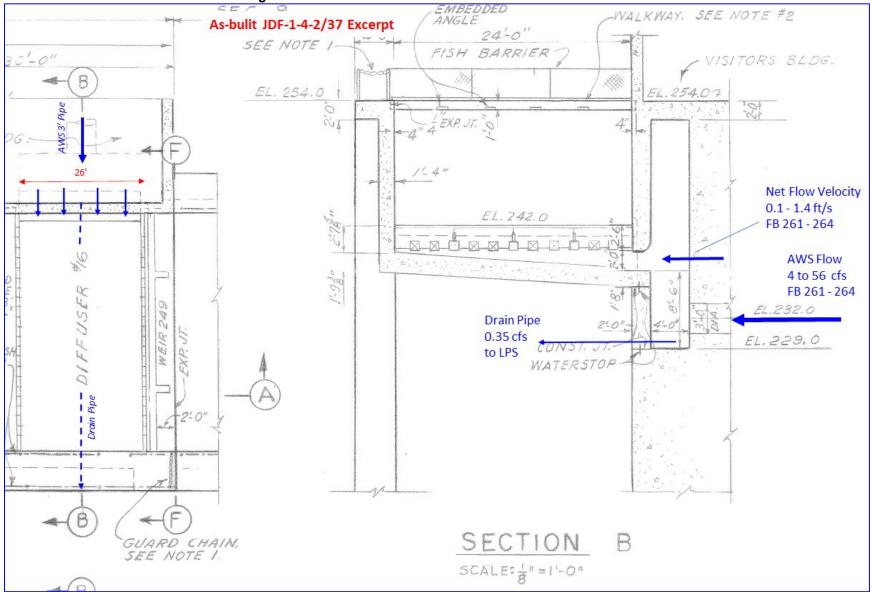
As-built Plan and Elevation Views of Diffuser 16.
